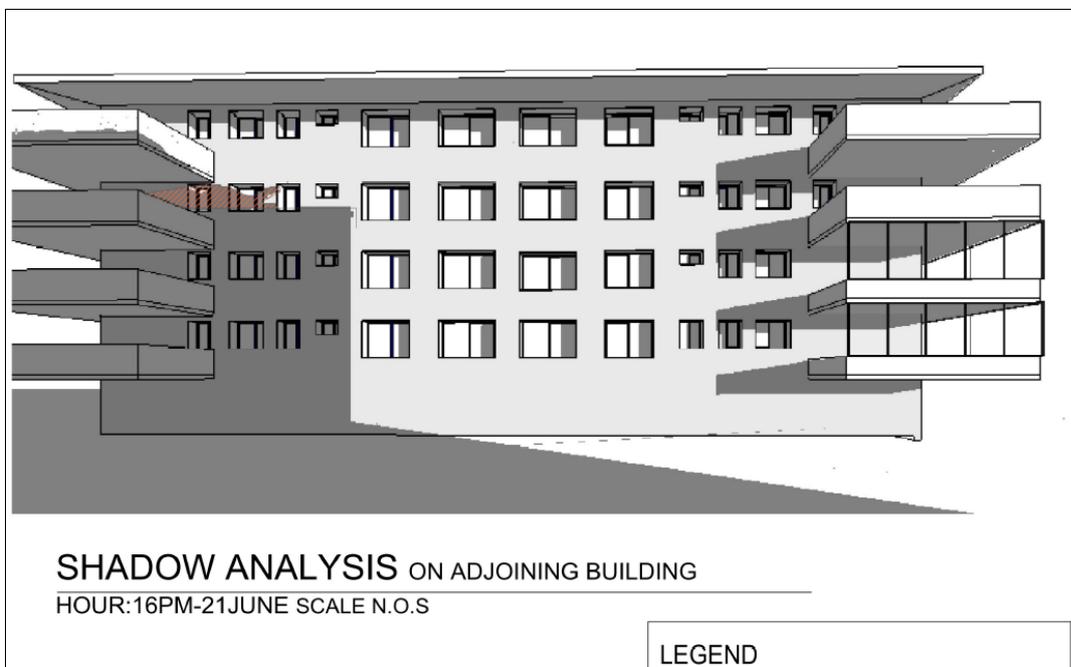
Additional shadow cast to the south at 4:00pm (hatched in brown)
